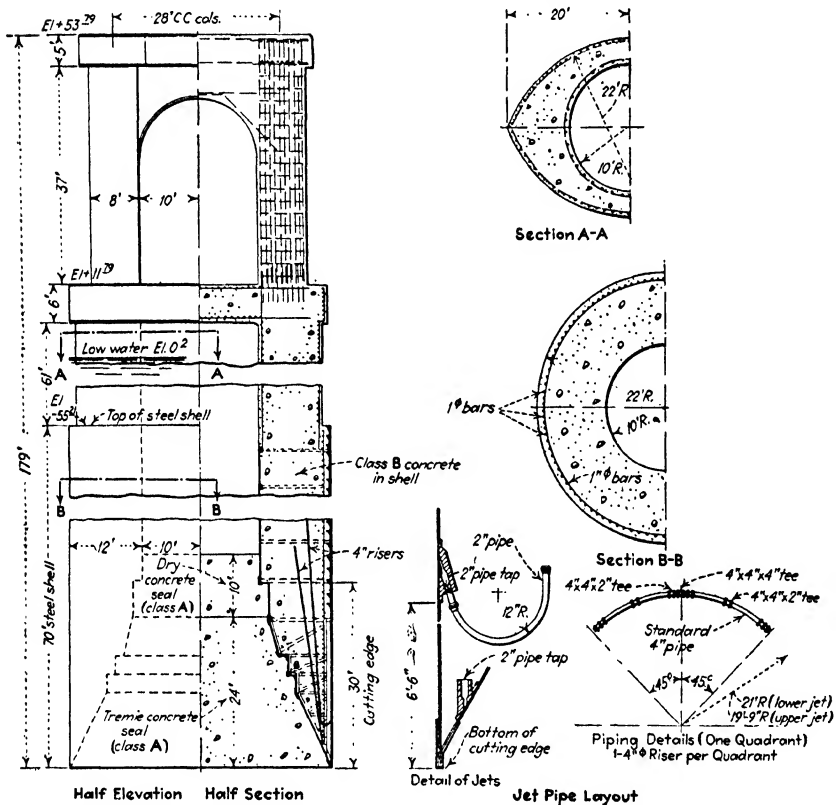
Metal Cylinder Caisson for the Atchafalaya River Bridge at Morgan City, La.
